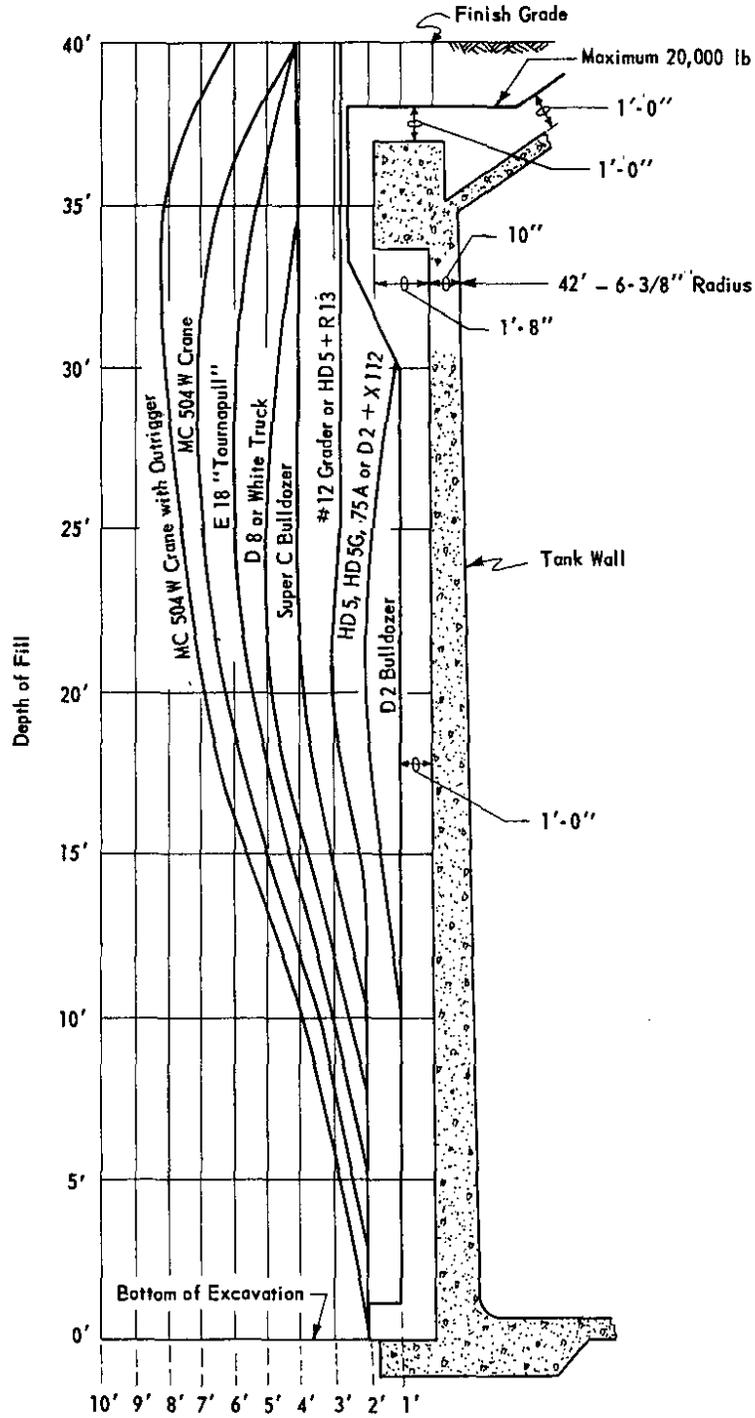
EXHIBIT V MINIMUM APPROACH OF EQUIPMENT TO TANK WALL
